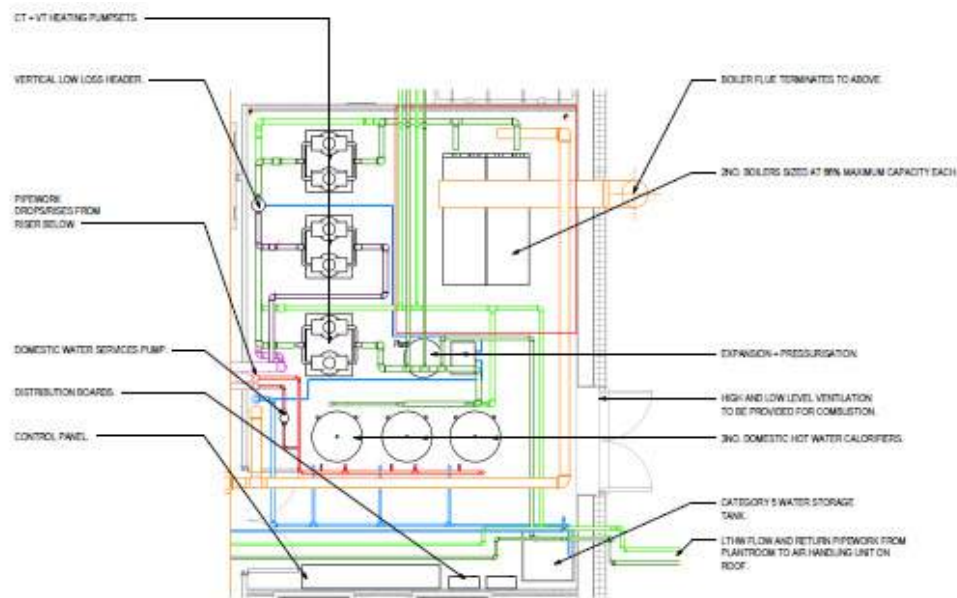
Second Floor (44.5m<sup>2</sup>) Plantroom Layout – Turing House School
